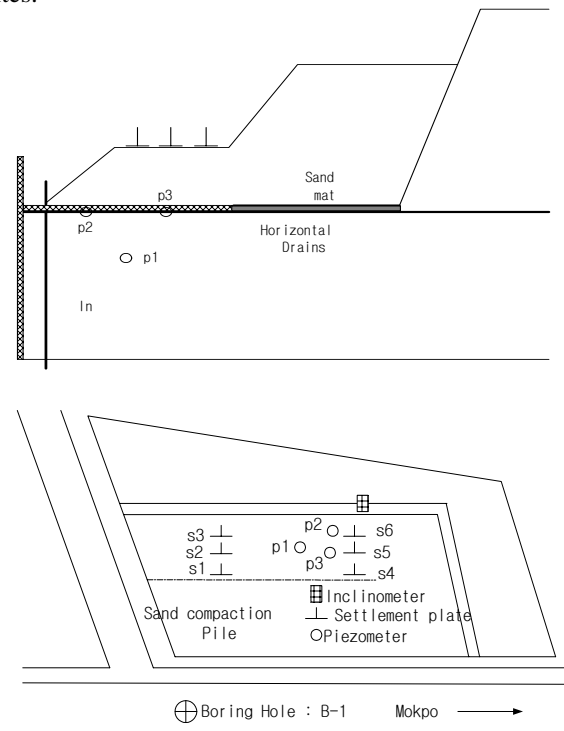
Instrumentation plan and cross-section/plane view of MM26-CW
